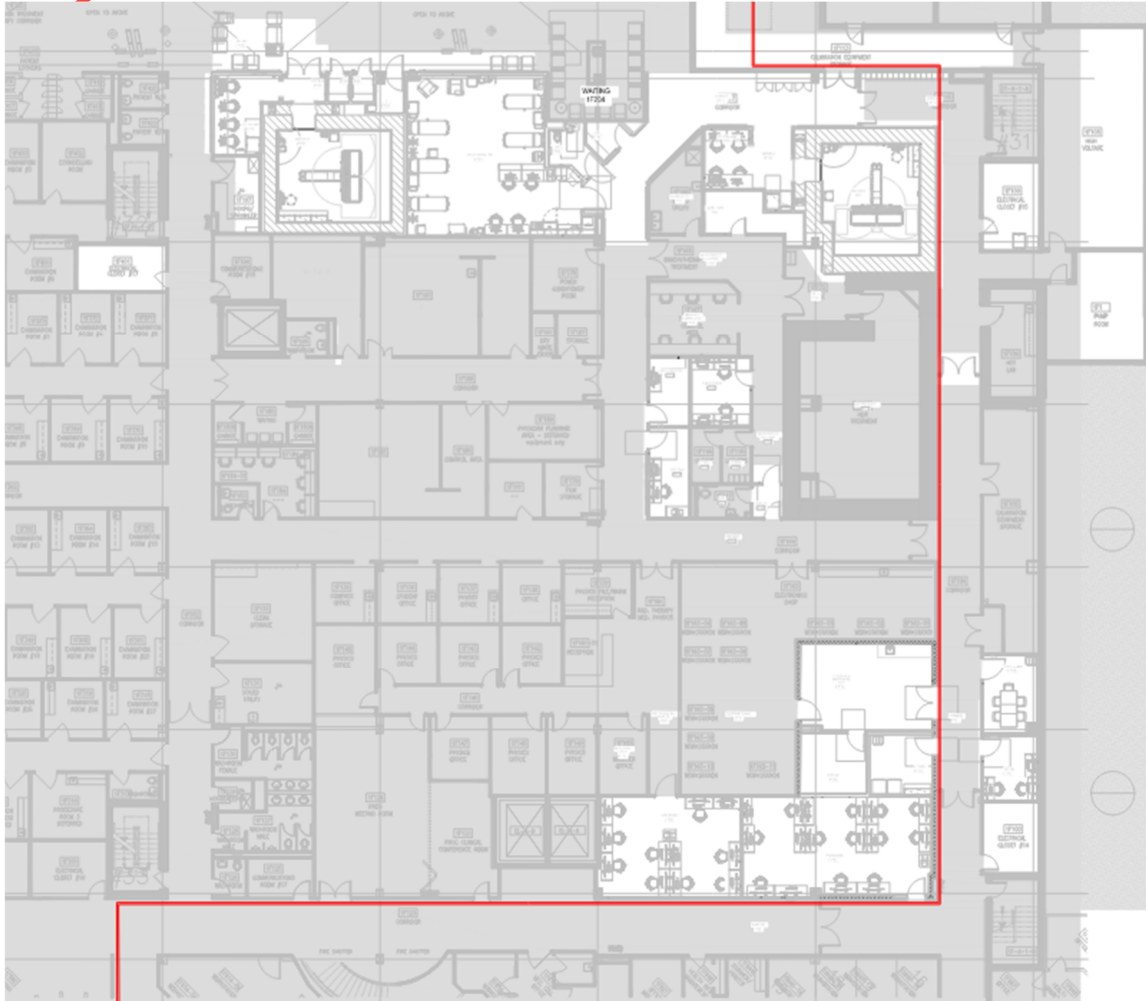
Proposed conduit runs through corridors above ceiling space
